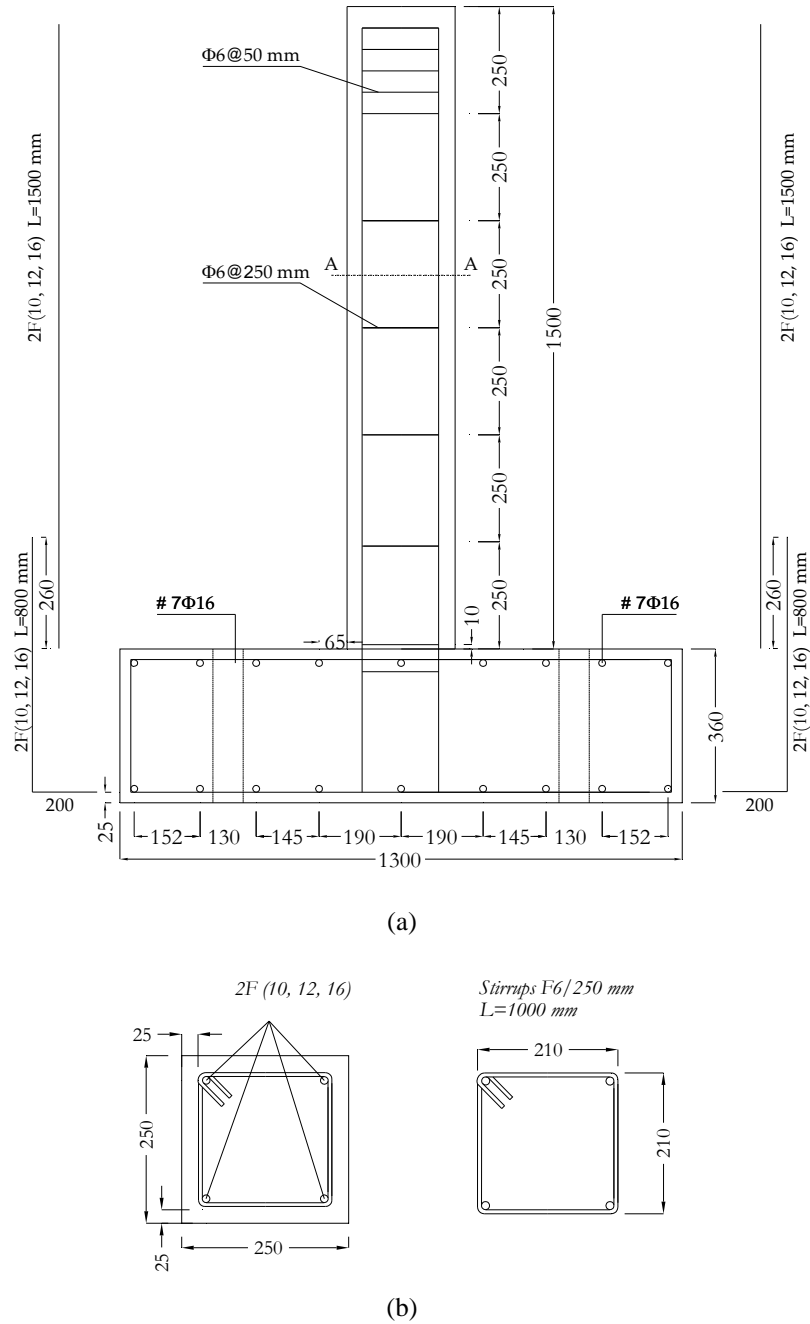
(a) Geometry of the specimens and (b) transverse section (all dimensions are in mm).
